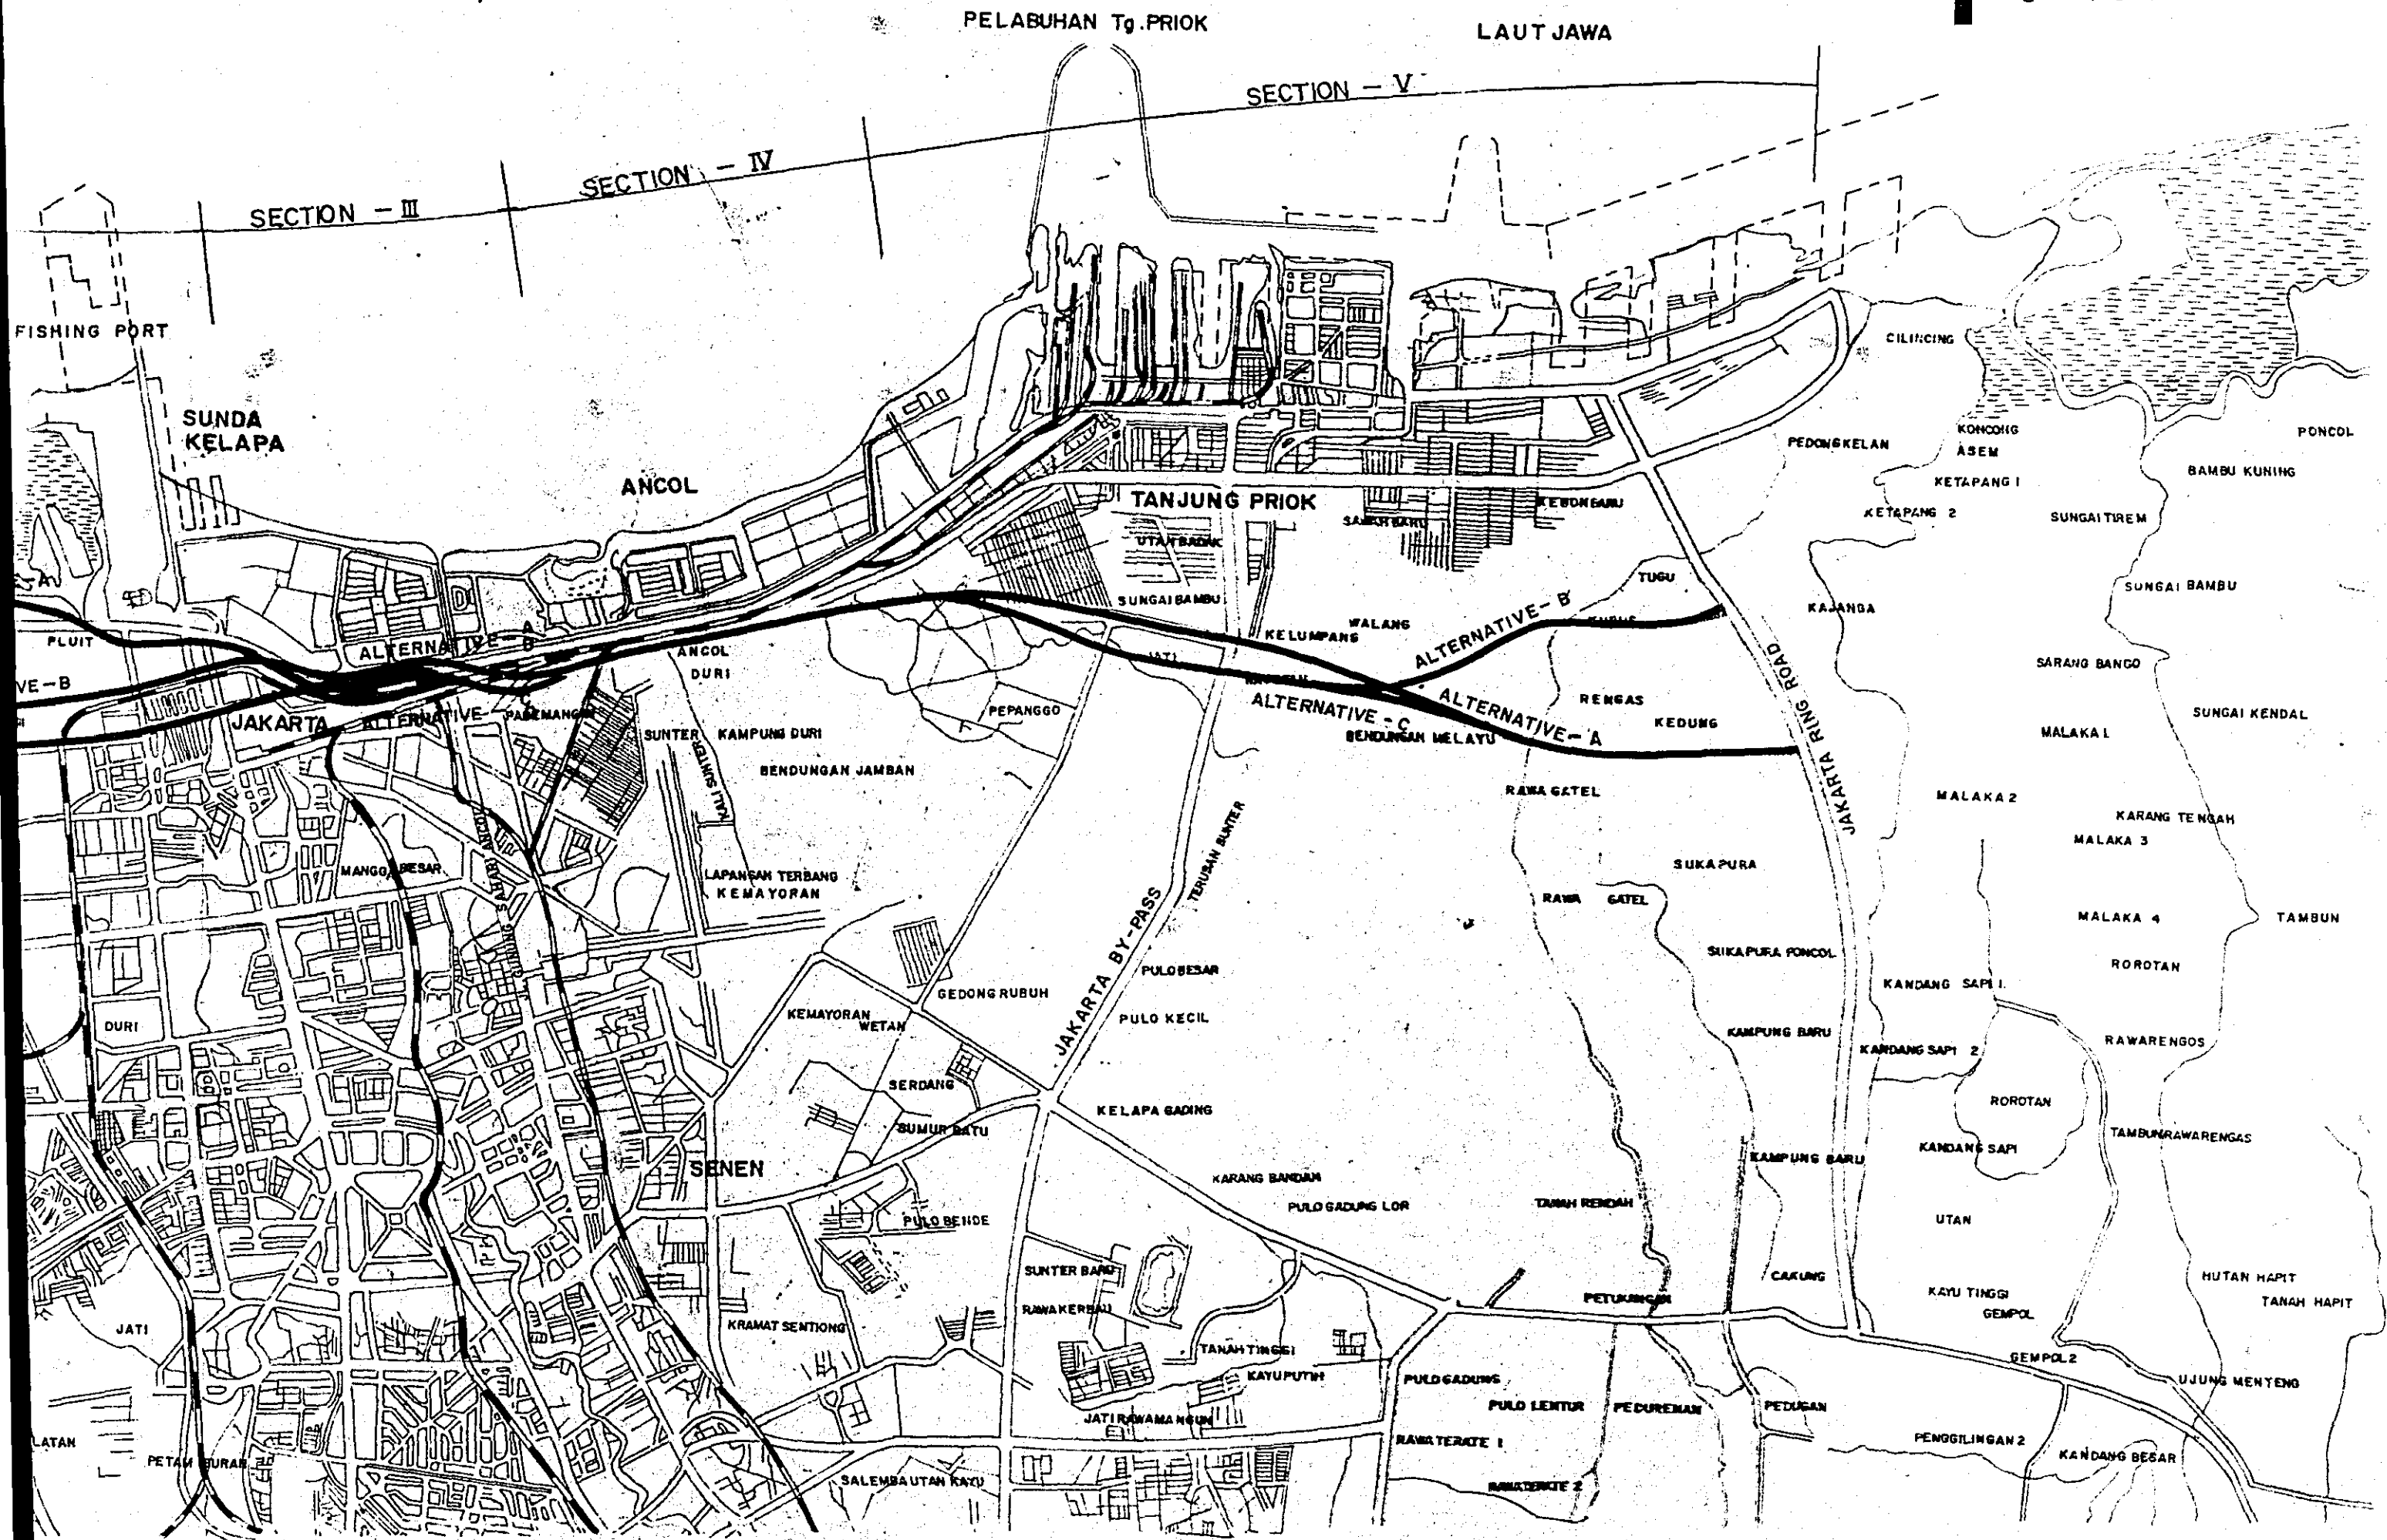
PLAN OF ALTERNATIVE ROUTES
